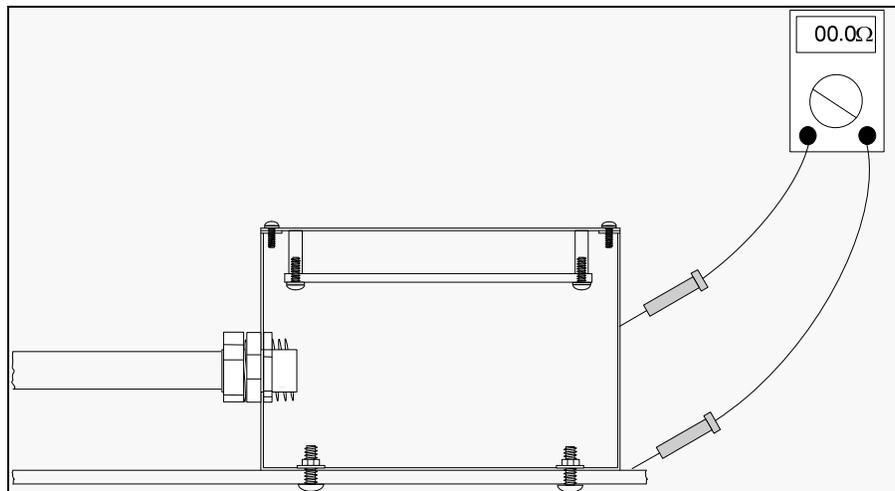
Continuity Testing - Mounting Surface to Enclosure
